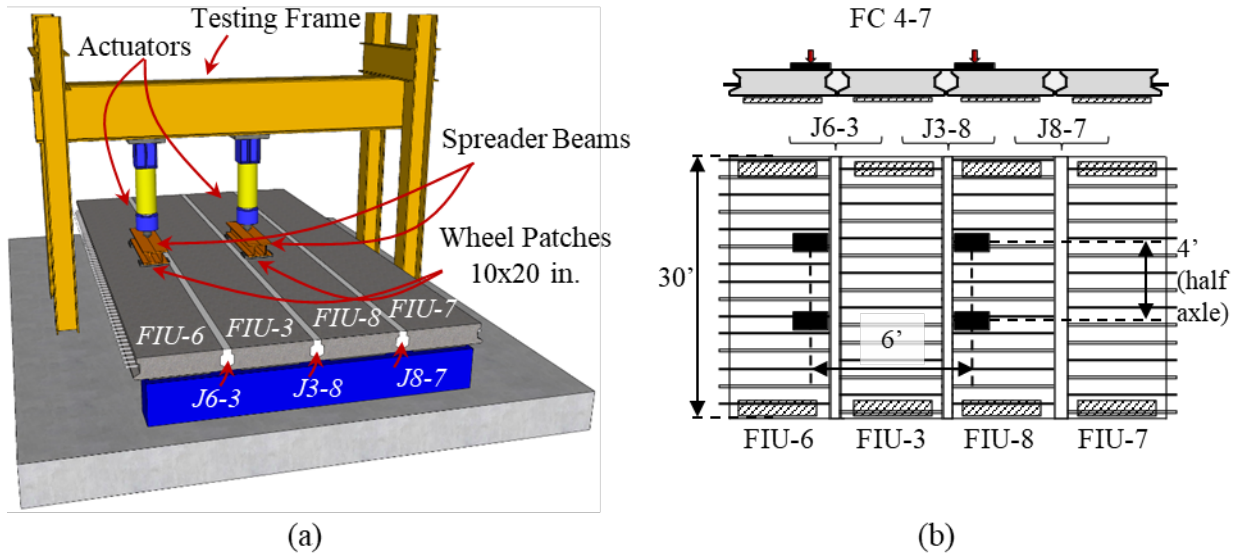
Proposed test setup for Fatigue Configuration 4-7 (a) schematic, (b) plan and elevation view
